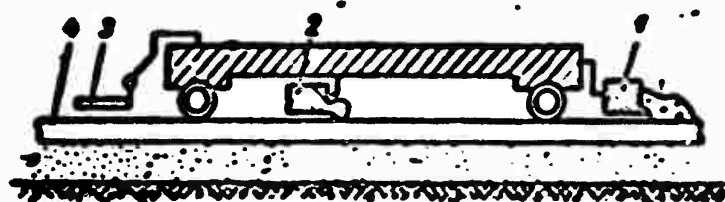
Diagram of the D-182V concrete finisher. 1) Vibrating tamper; 2) screed; 3) finishing belt; 4) paving form.
